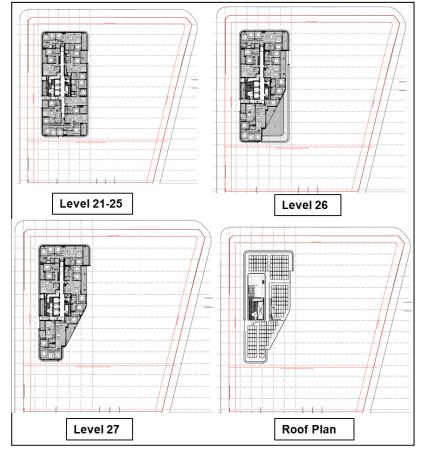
| Proposed Floor Plans (Source: Applicant's Architectural Plans, Rev F dated 27/05/2024)
